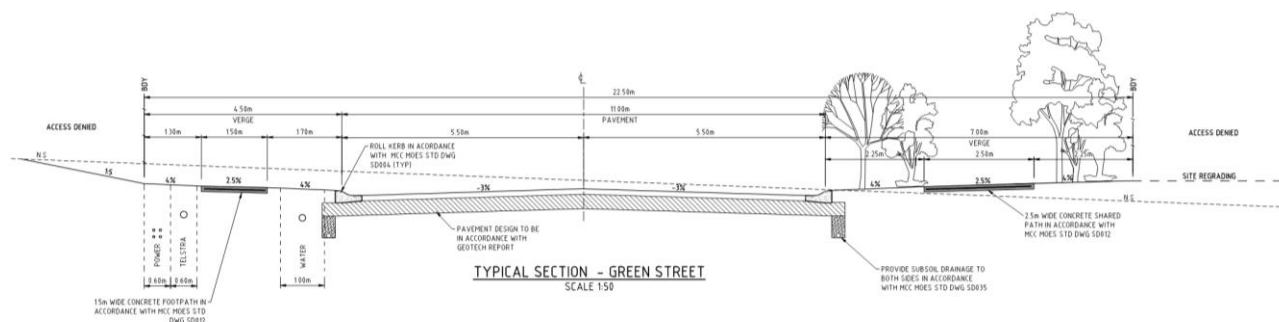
Proposed Typical Cross Section of the Local Roads (Source: GCA Engineering Solutions, Note: NOT TO SCALE in this Report)
